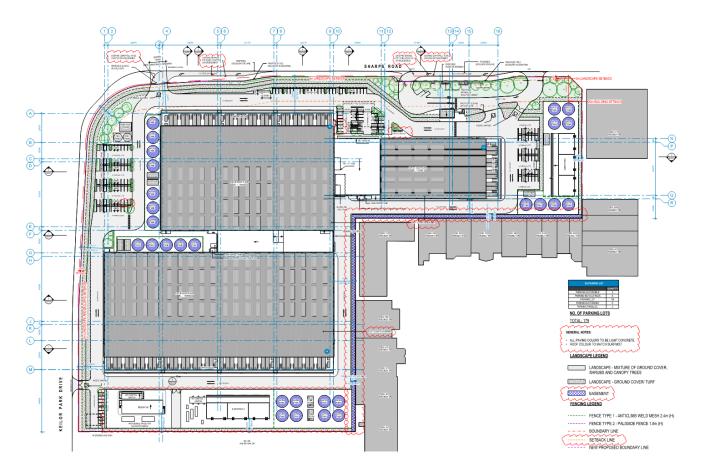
Proposed Ground Floor Plan (Source: Greenbox – 17.12.24)
